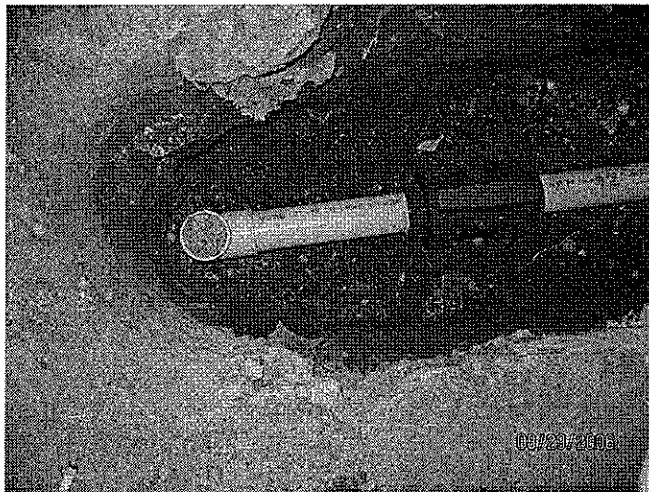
VEW-1 riser connected wTEE to Sch80 2" PVC pipe connecting to a ball valve;
